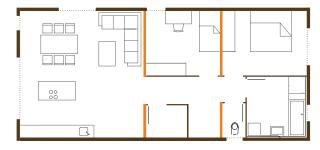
Floor plan of a flat in the timber construction design Residential floor space of 110 m²
